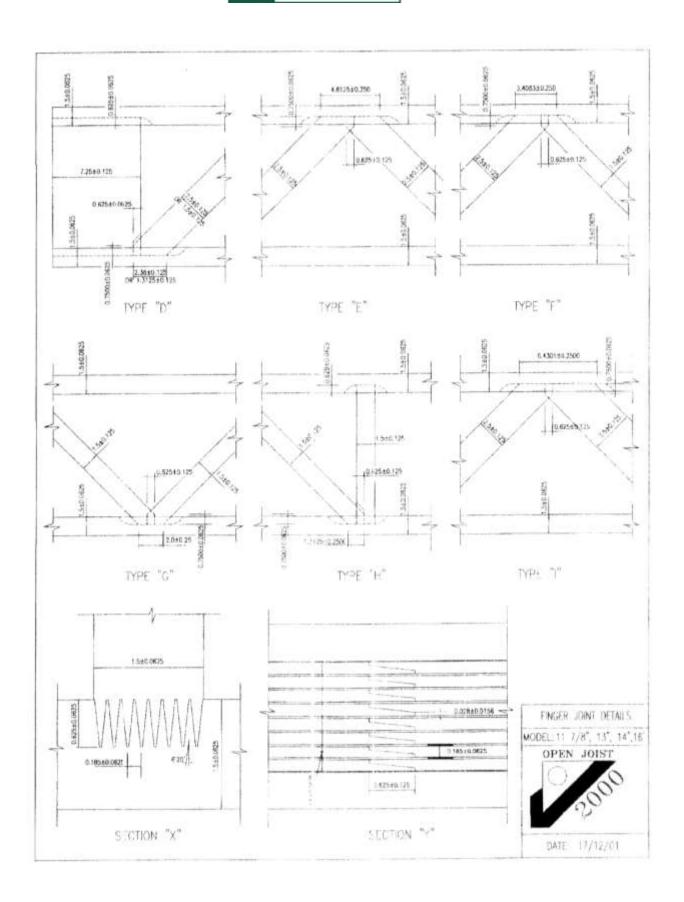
TYPICAL TRUSS DETAILS (Continued)
